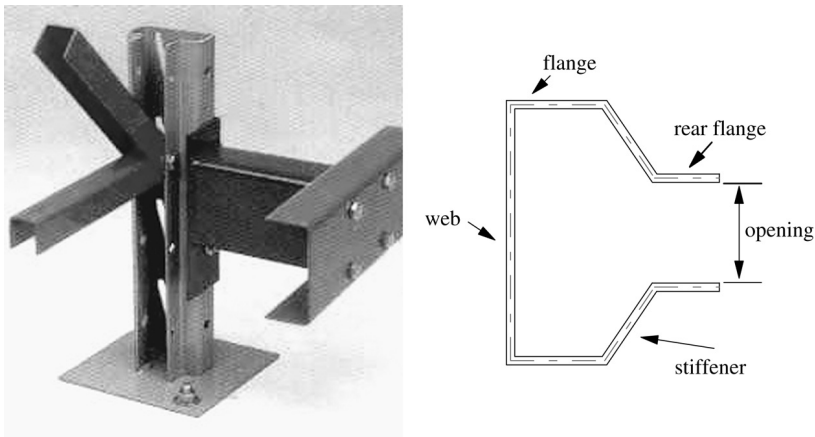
Connections in the column (Águia), “Rack” cross-section type and nomenclature.
